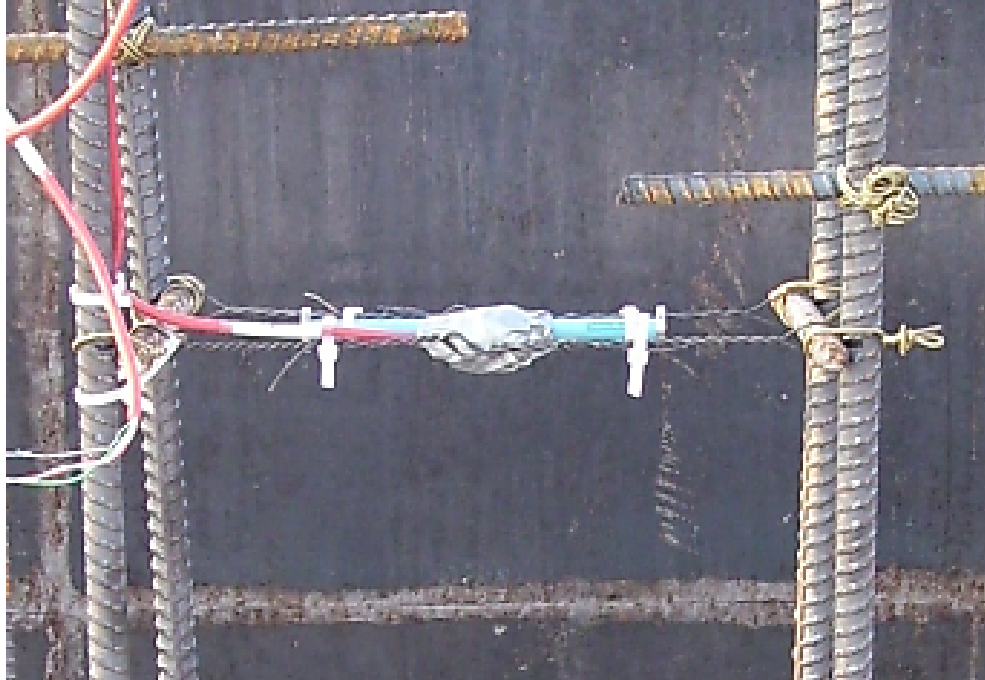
VWSG Secured in Web of a Bulb Tee Girder
